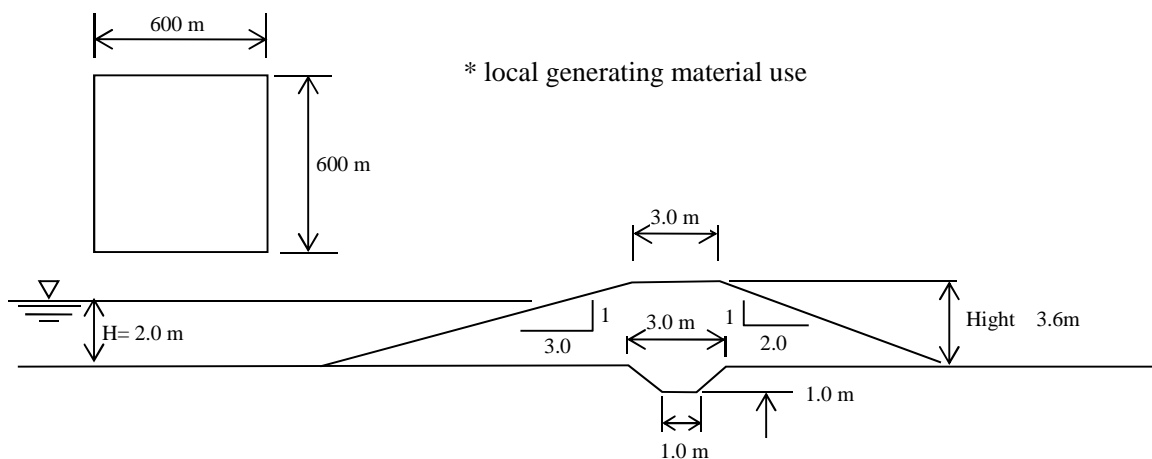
Plan and Cross Section (V New Reservoir Construction in the Thilawa SEZ area)
